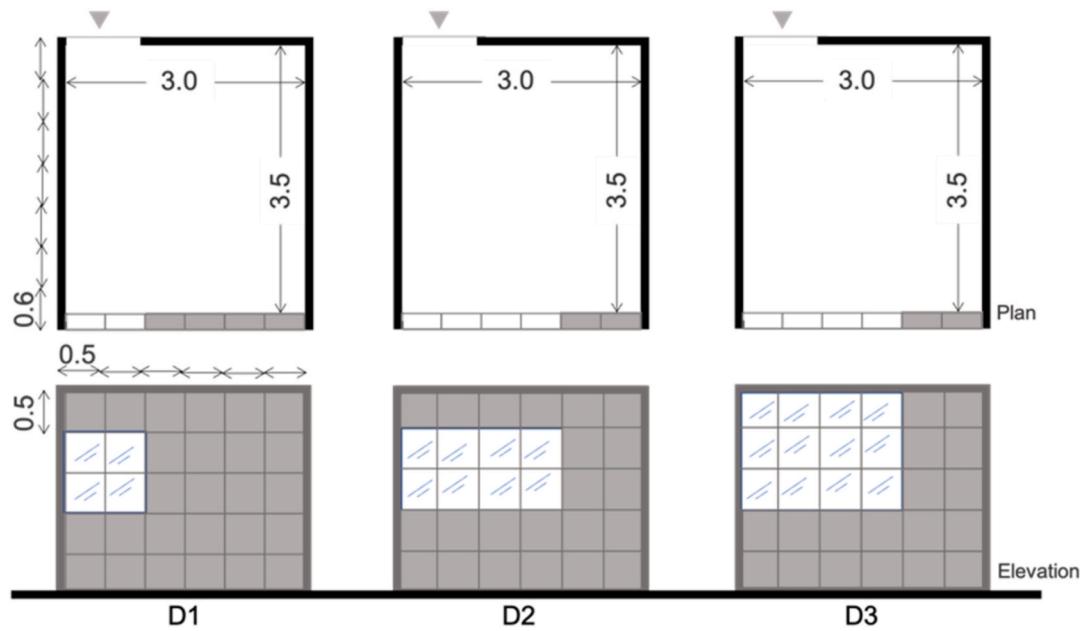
Floor Plan and Schematic Elevation of the rooms with the three different opening sizes for daylight.
